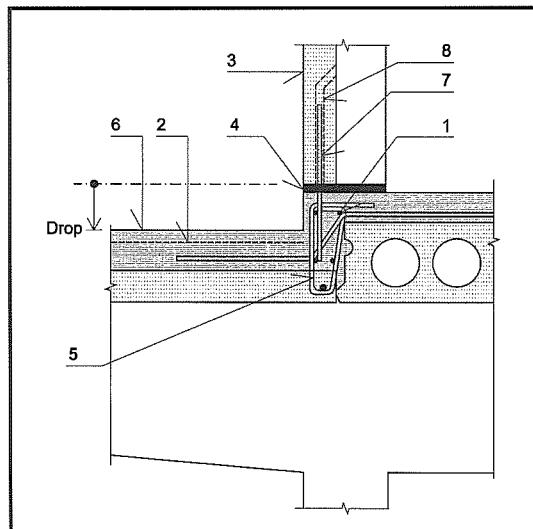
Internal Floor To Corridor And Partition Wall Connection To Floor
